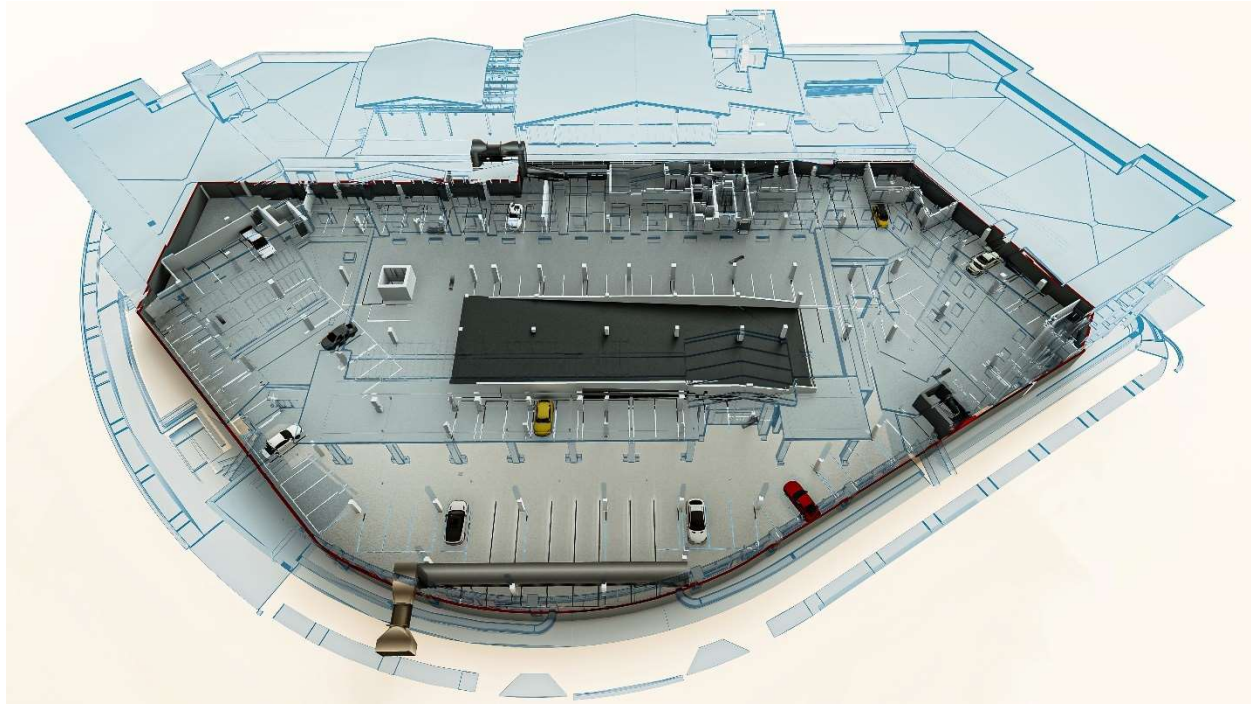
Revised ductwork layout and main supply/exhaust air grilles relocation for the parking garage
